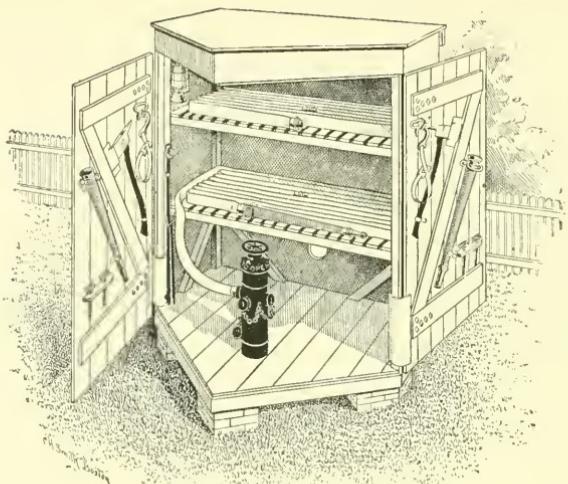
A HOSE AND HYDRANT HOUSE WITH FULL EQUIPMENT: 200 FT. OF COTTON RUBBER-LINED HOSE, 2 BARS, 4 SPANNERS, 3 PLAYPIPES, 2 LADDER STRAPS, 1 NOZZLE HOLDER AND 1 HEAVY MILL LANTERN.
